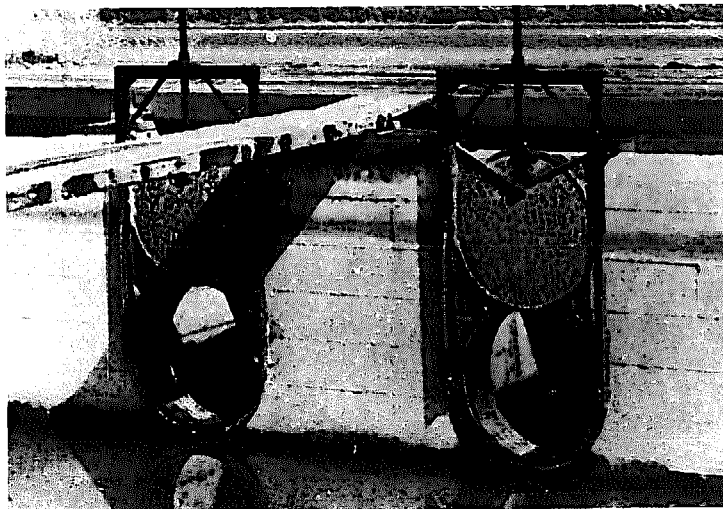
Underflow control gates set in concrete headwall, for releasing water into field ditches or pipelines.
